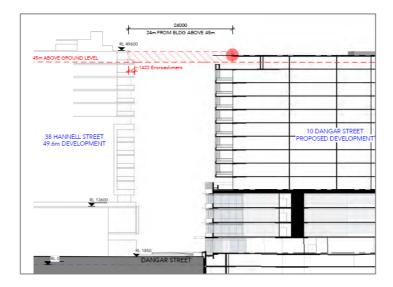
below demonstrate a small non-compliance between the proposed building and the adjoining building at 38 Hannell Street.
